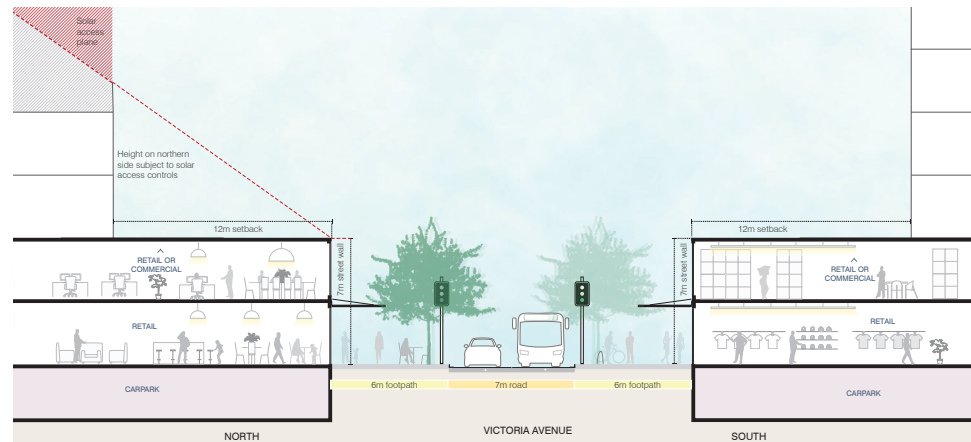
Section of Victoria Avenue street concept (facing east)
